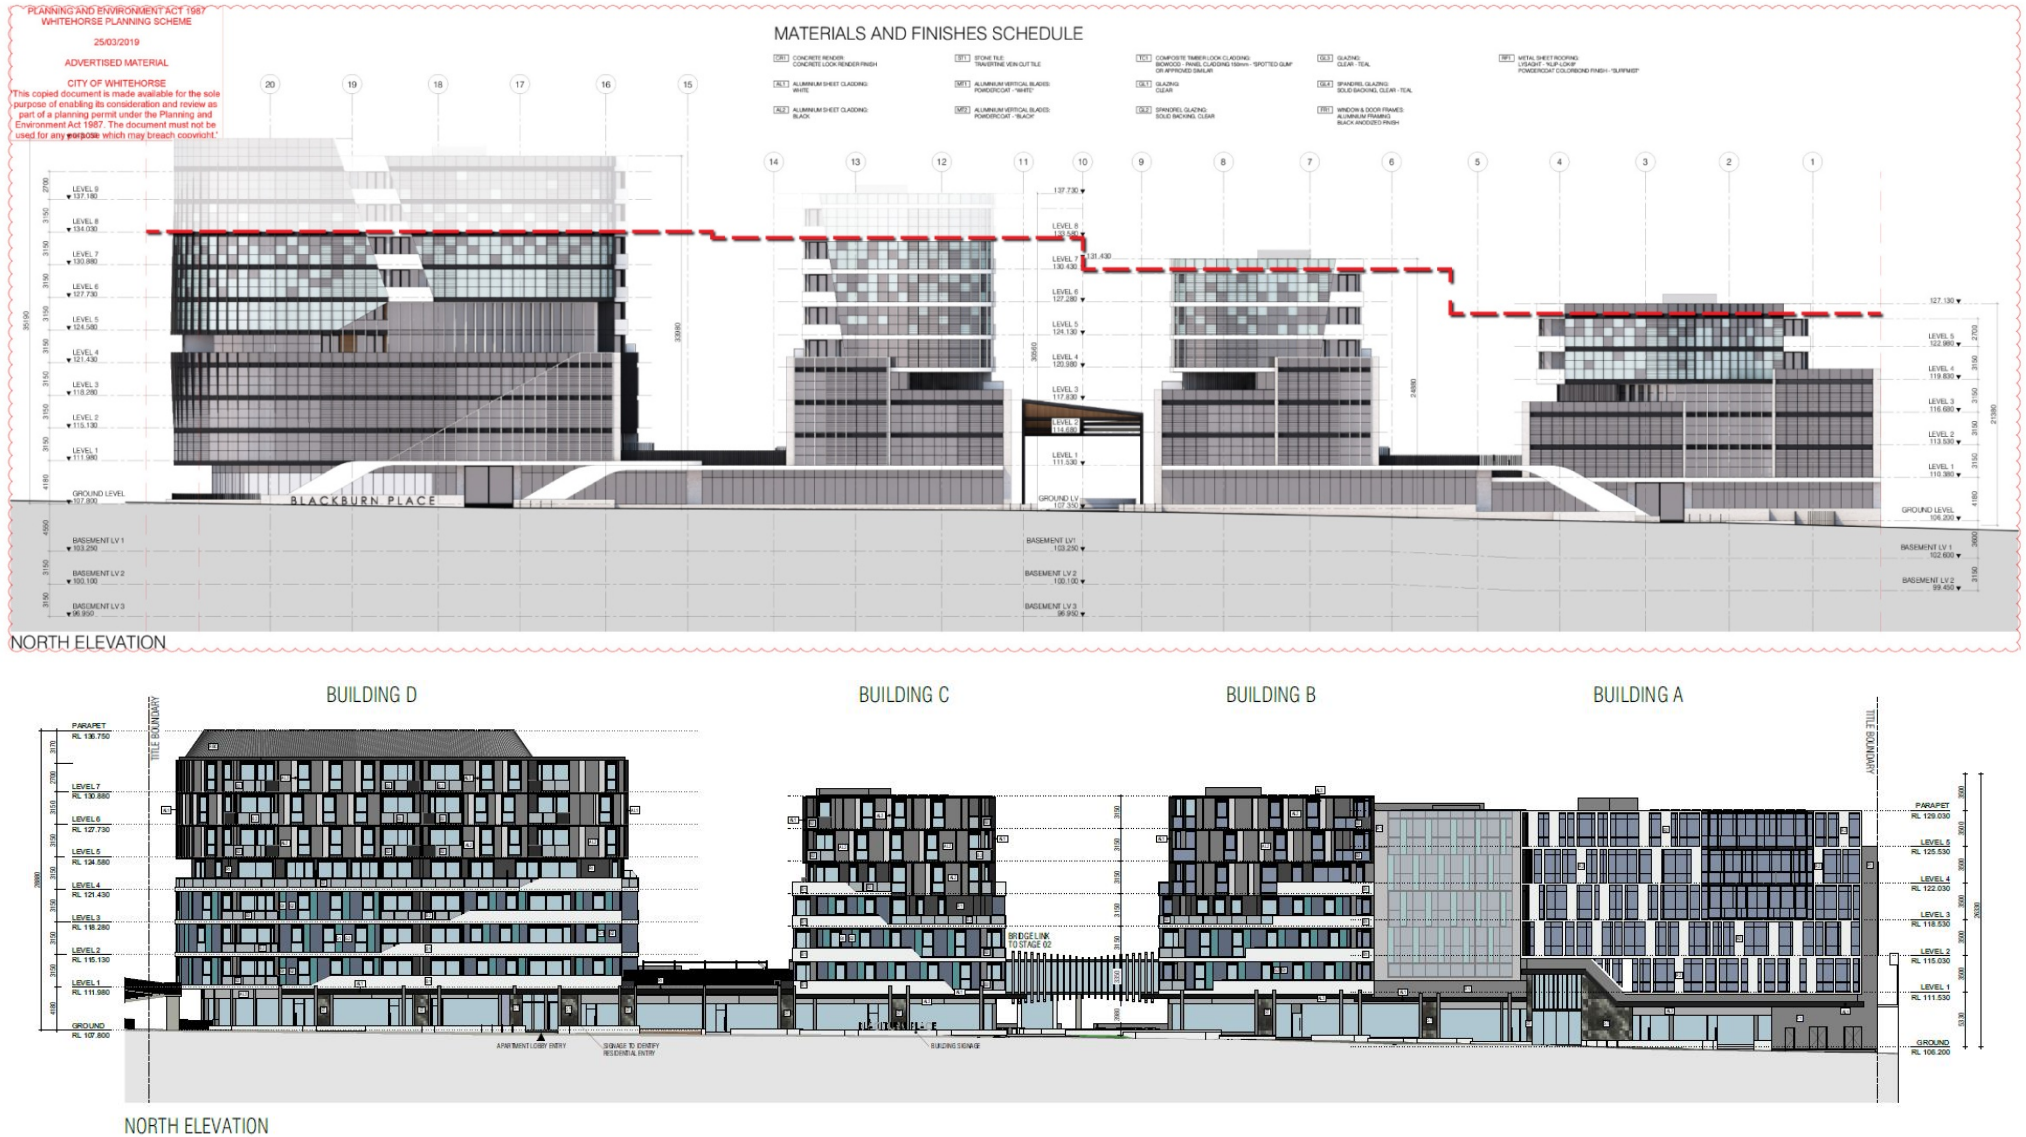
Taouk Proposal elevation with VCAT showing amended building heights (top) and Ascui April 2019 proposal elevation (bottom)
